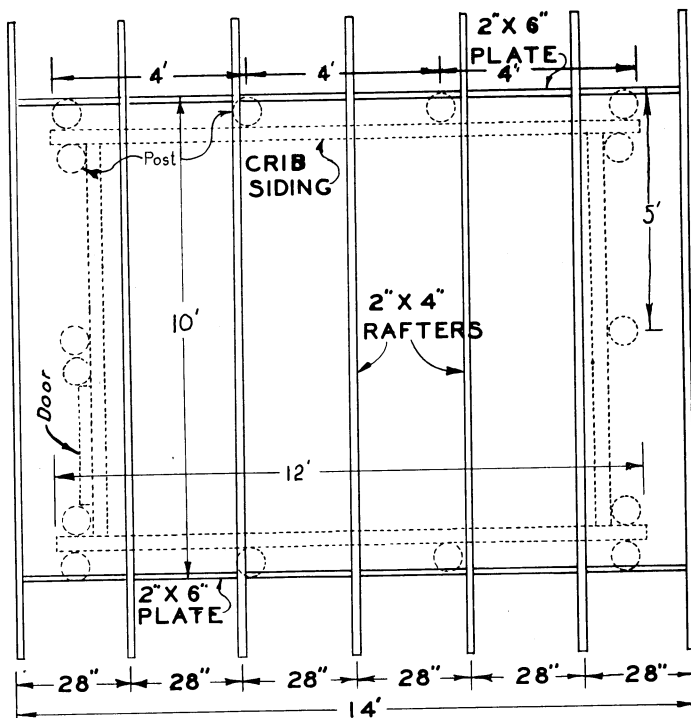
Ground and roof framing plan for 10' x 12' pole crib.
